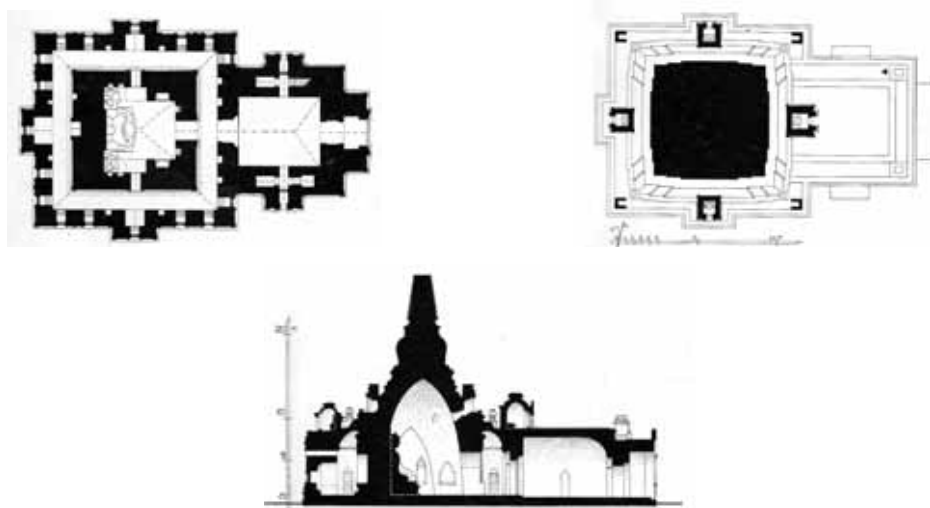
Ground floor plan, upper floor plan and cross section of Pa-Hto-Tha-Myar temple
